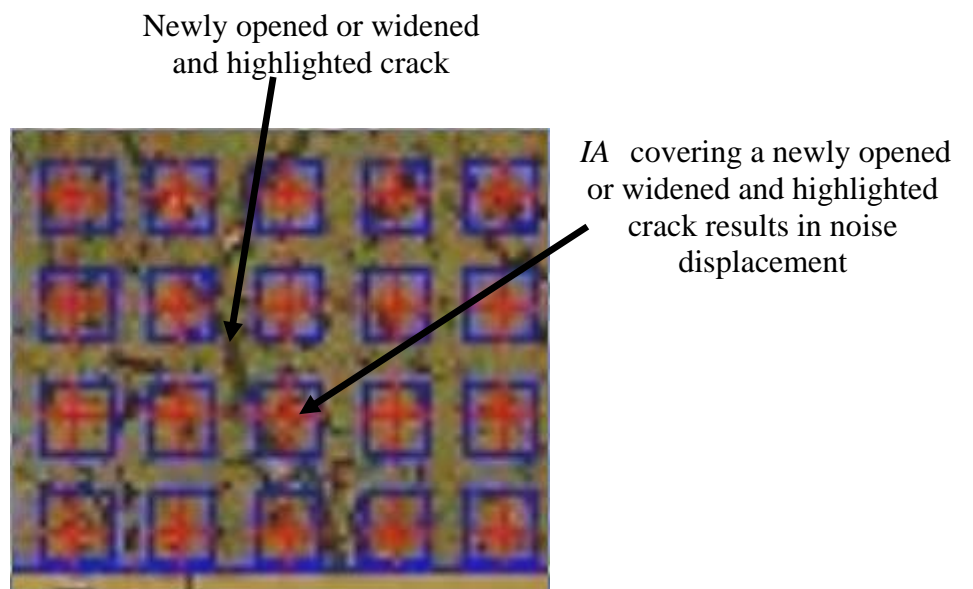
The choice of IA size and IA centre spacing to deal with cracks appearing on concrete surface
